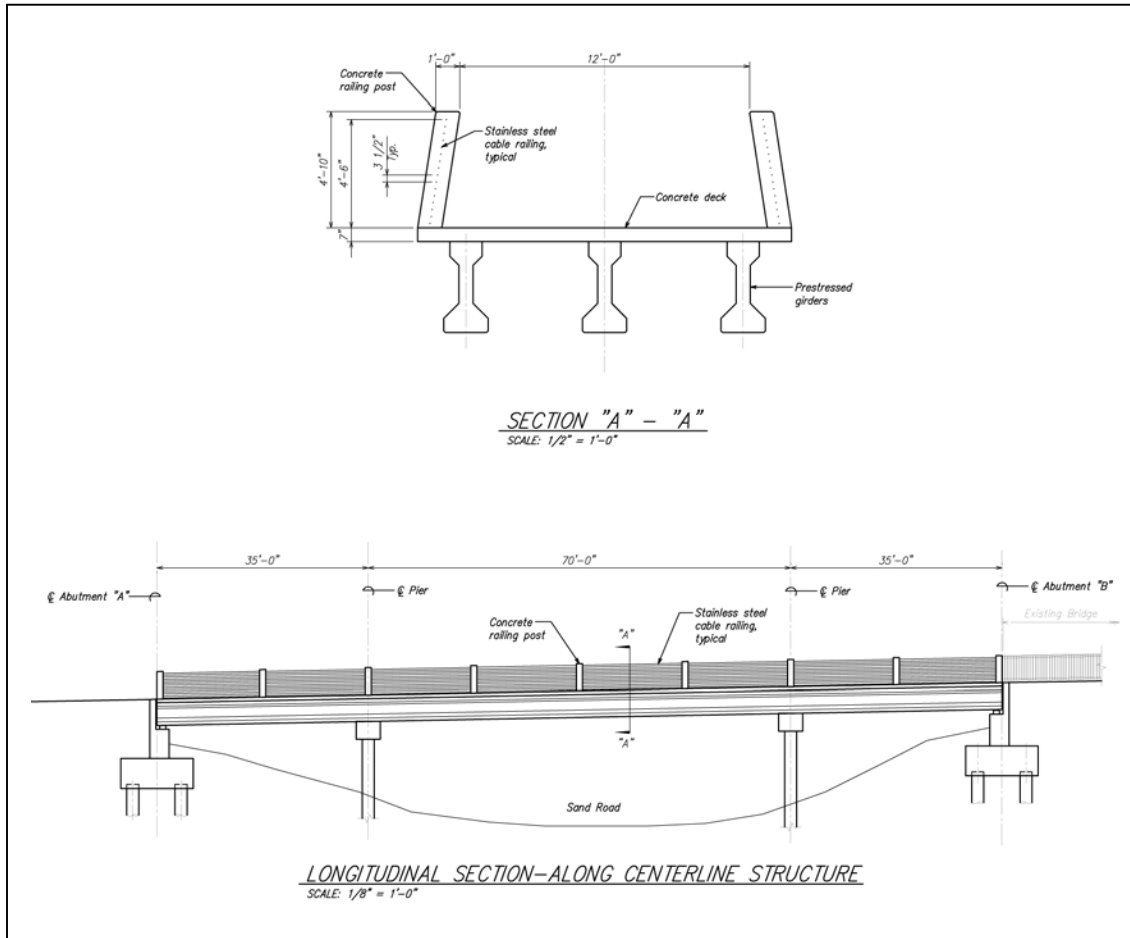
Proposed Lydgate Park pre-stressed bridge option
